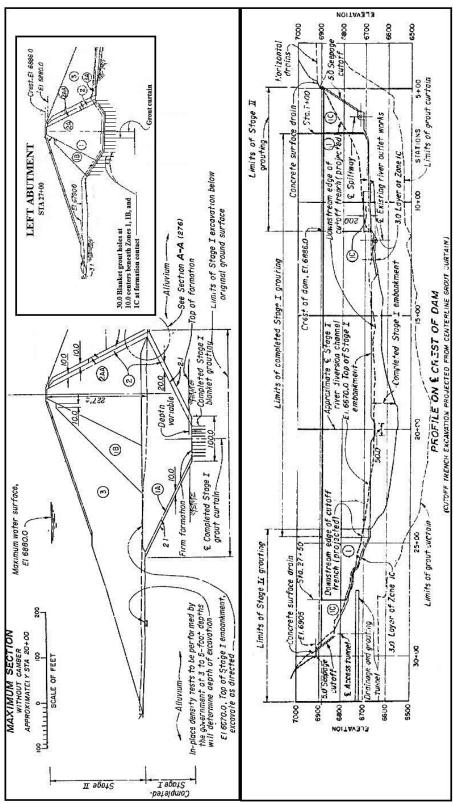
Section view of original grout curtain design at Ridgway Dam.
